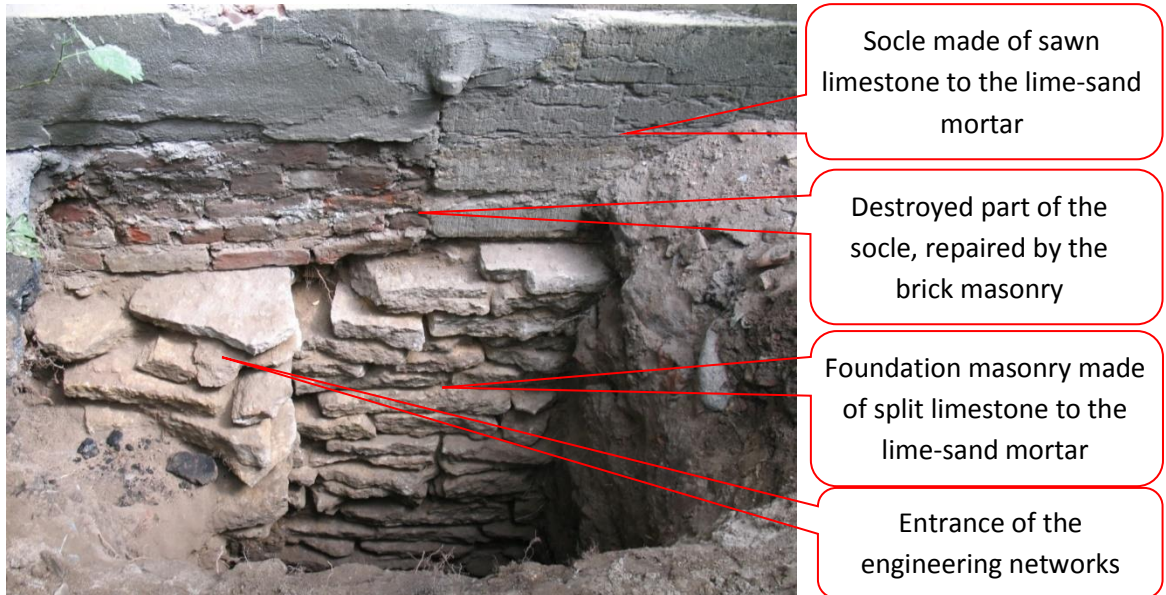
Saint-Petersburg. Sadovaya Street house 8/7, 2008 year. Foundation of the longitudinal wall of the building. Absence of the foundation waterproofing. Damages in the place of the engineering networks entrance.  $\frac{1}{2}$  part of the socle is under the ground surface level. Absence of the masonry mortar in the outer masonry layer. Absence of the hydro isolation between foundation and wall. Absence of vertical foundation waterproofing
